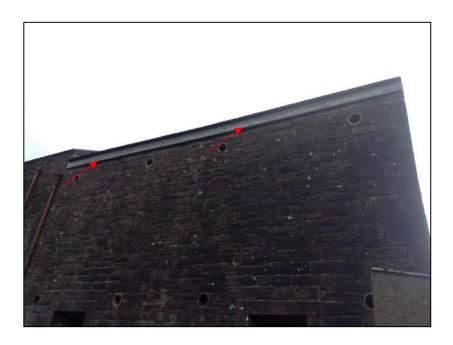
Southern elevation of Building 3. Gaps under wooden bargeboards provide a potential roost feature. Access to internal areas of barn may be acquired through circular vents.
